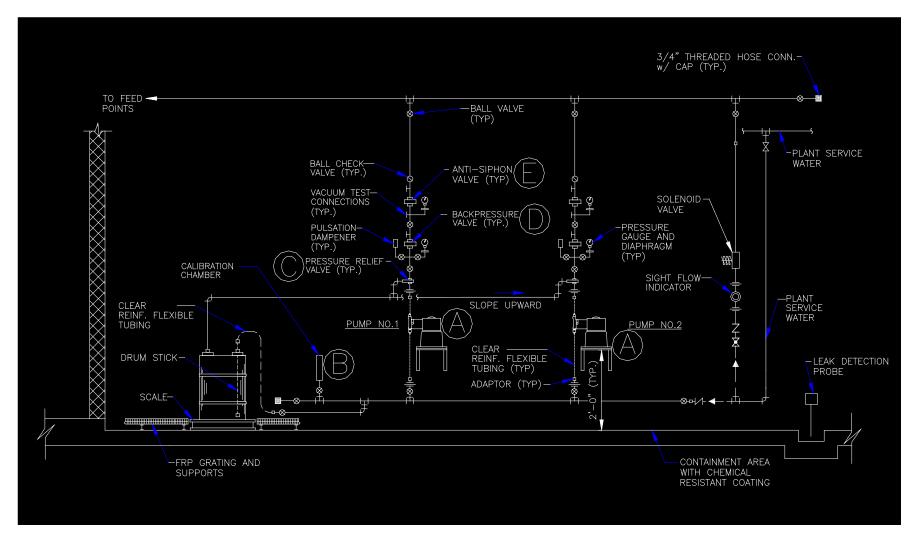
Typical Drum Storage Liquid Chemical Feed System
